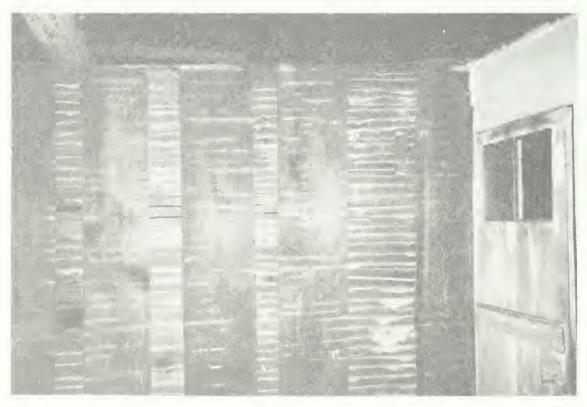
North servant's room (Room 208), south and west walls, doorway D206 at right.
